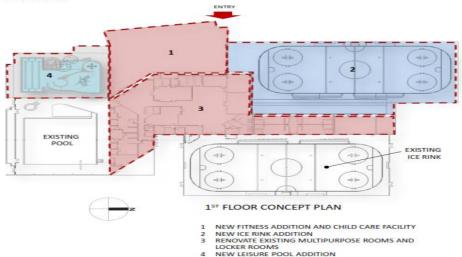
Mt. Vernon Site and Concept Plans
